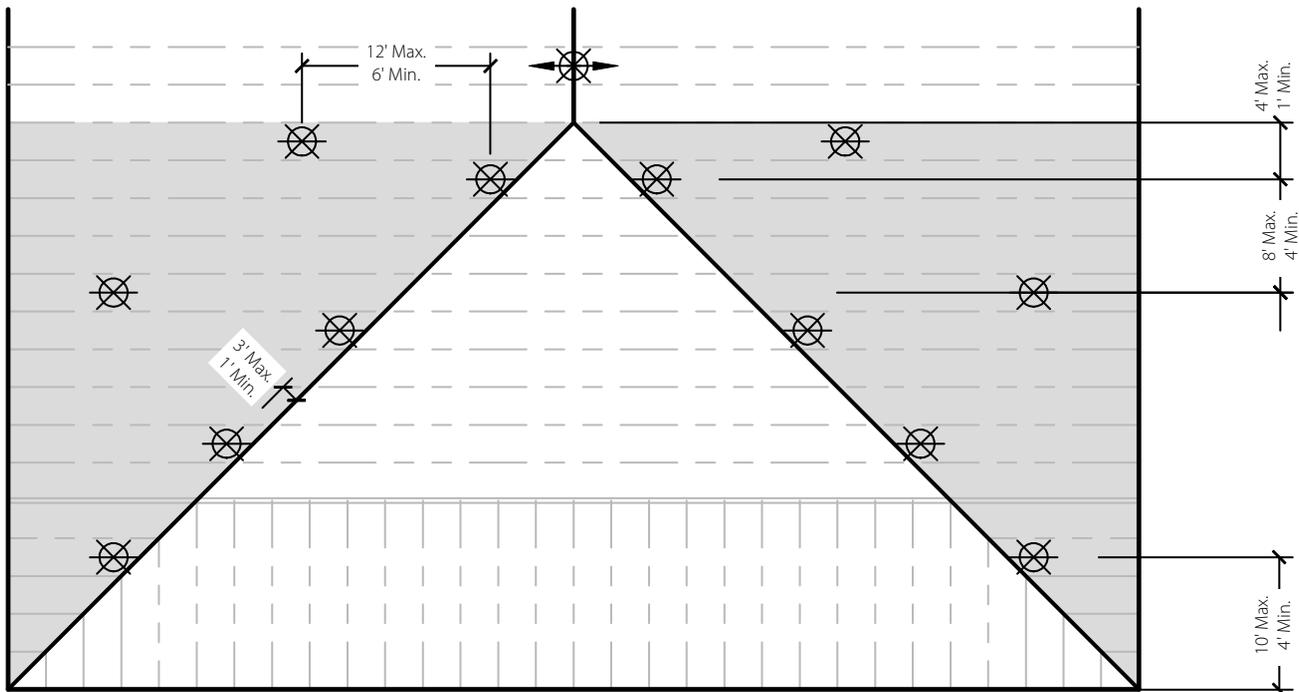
ADJACENT HIP LAYOUT CRITERIA USING FL-SA/GAP SPRINKLERS
